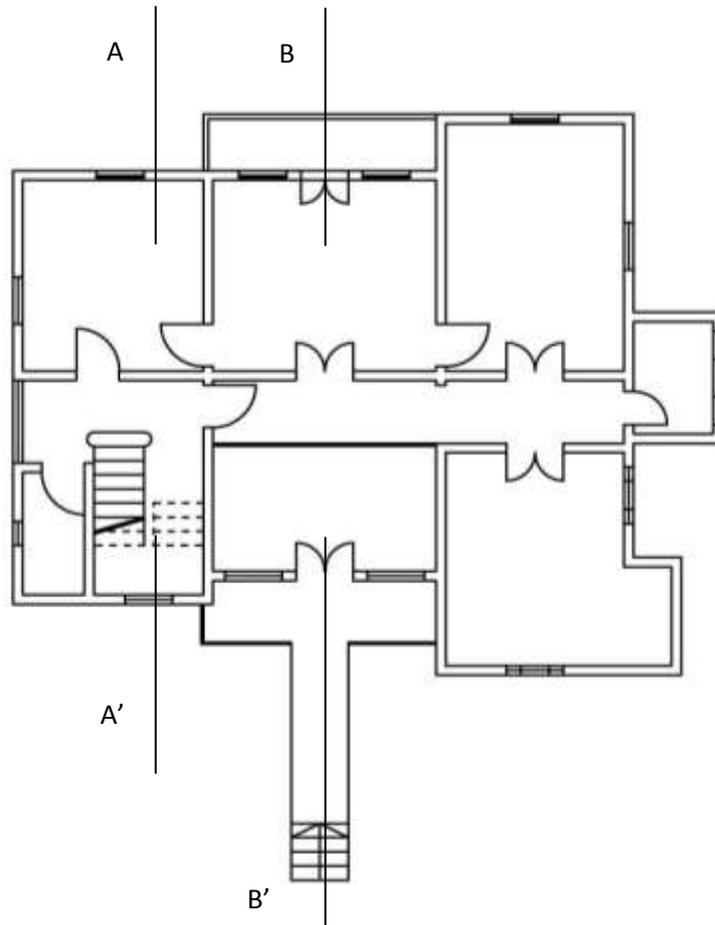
The first (entrance) floor plan of the house at 140 lot 4 parcel
